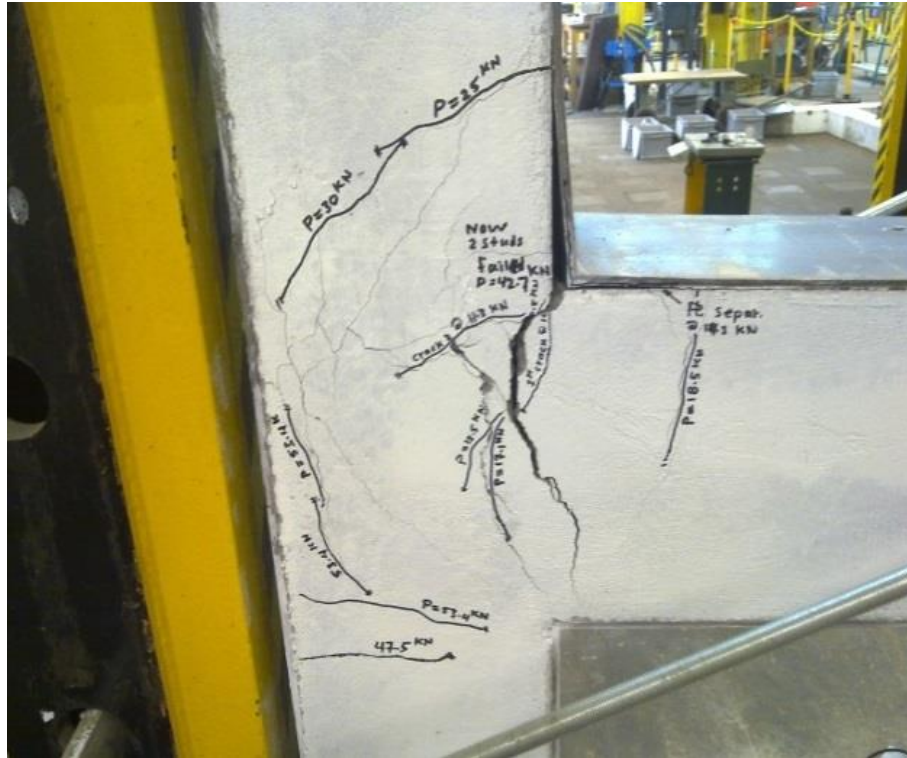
SCS joint with normal steel cracking after studs' failure
